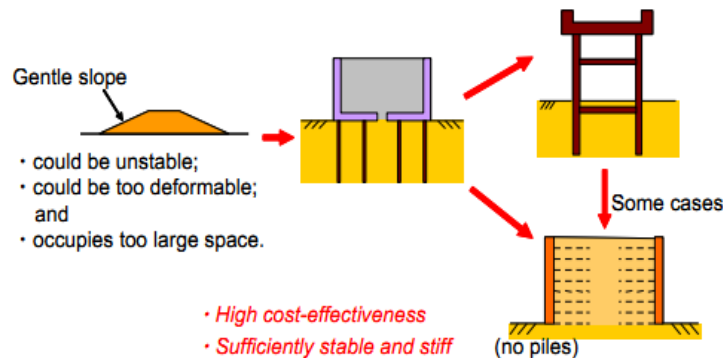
History of elevated railway and highway structure in Japan (after Palmeira et al., 2008)
